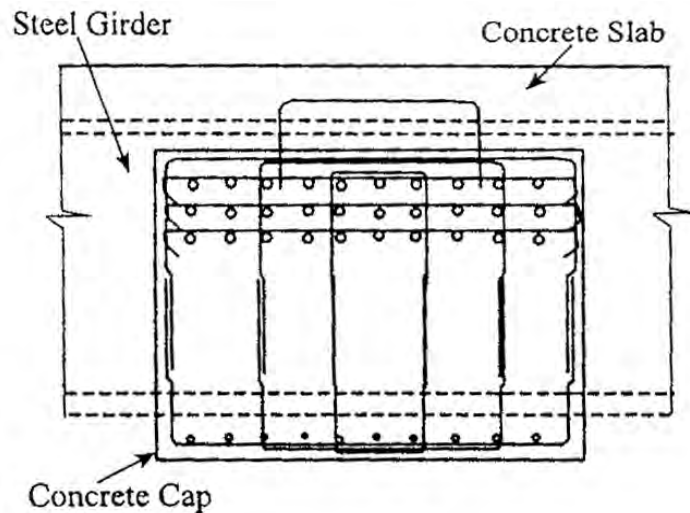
Detail of transverse reinforcement in the cap.
